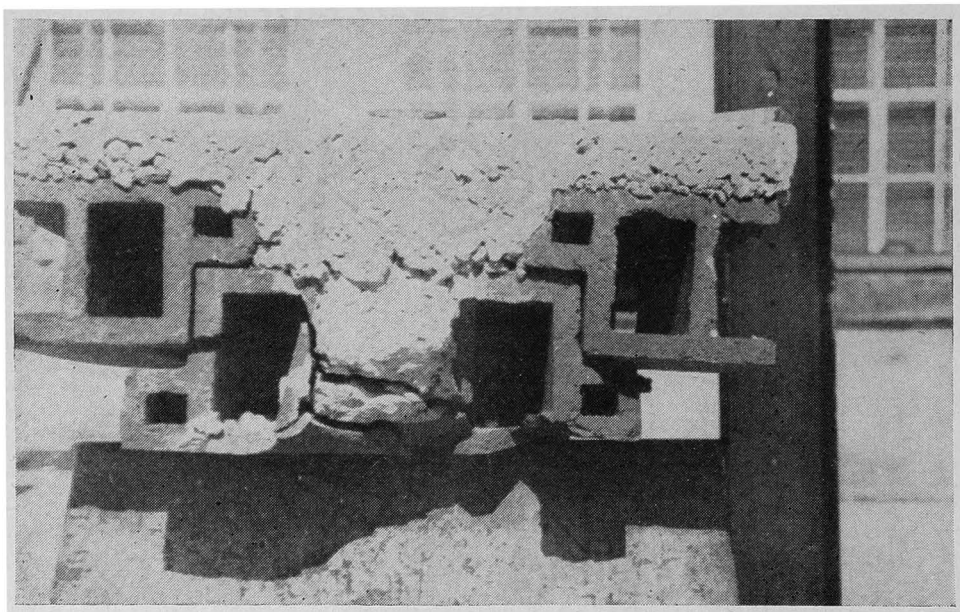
(b). Typical end failure of heavy type beams of Tile C.
